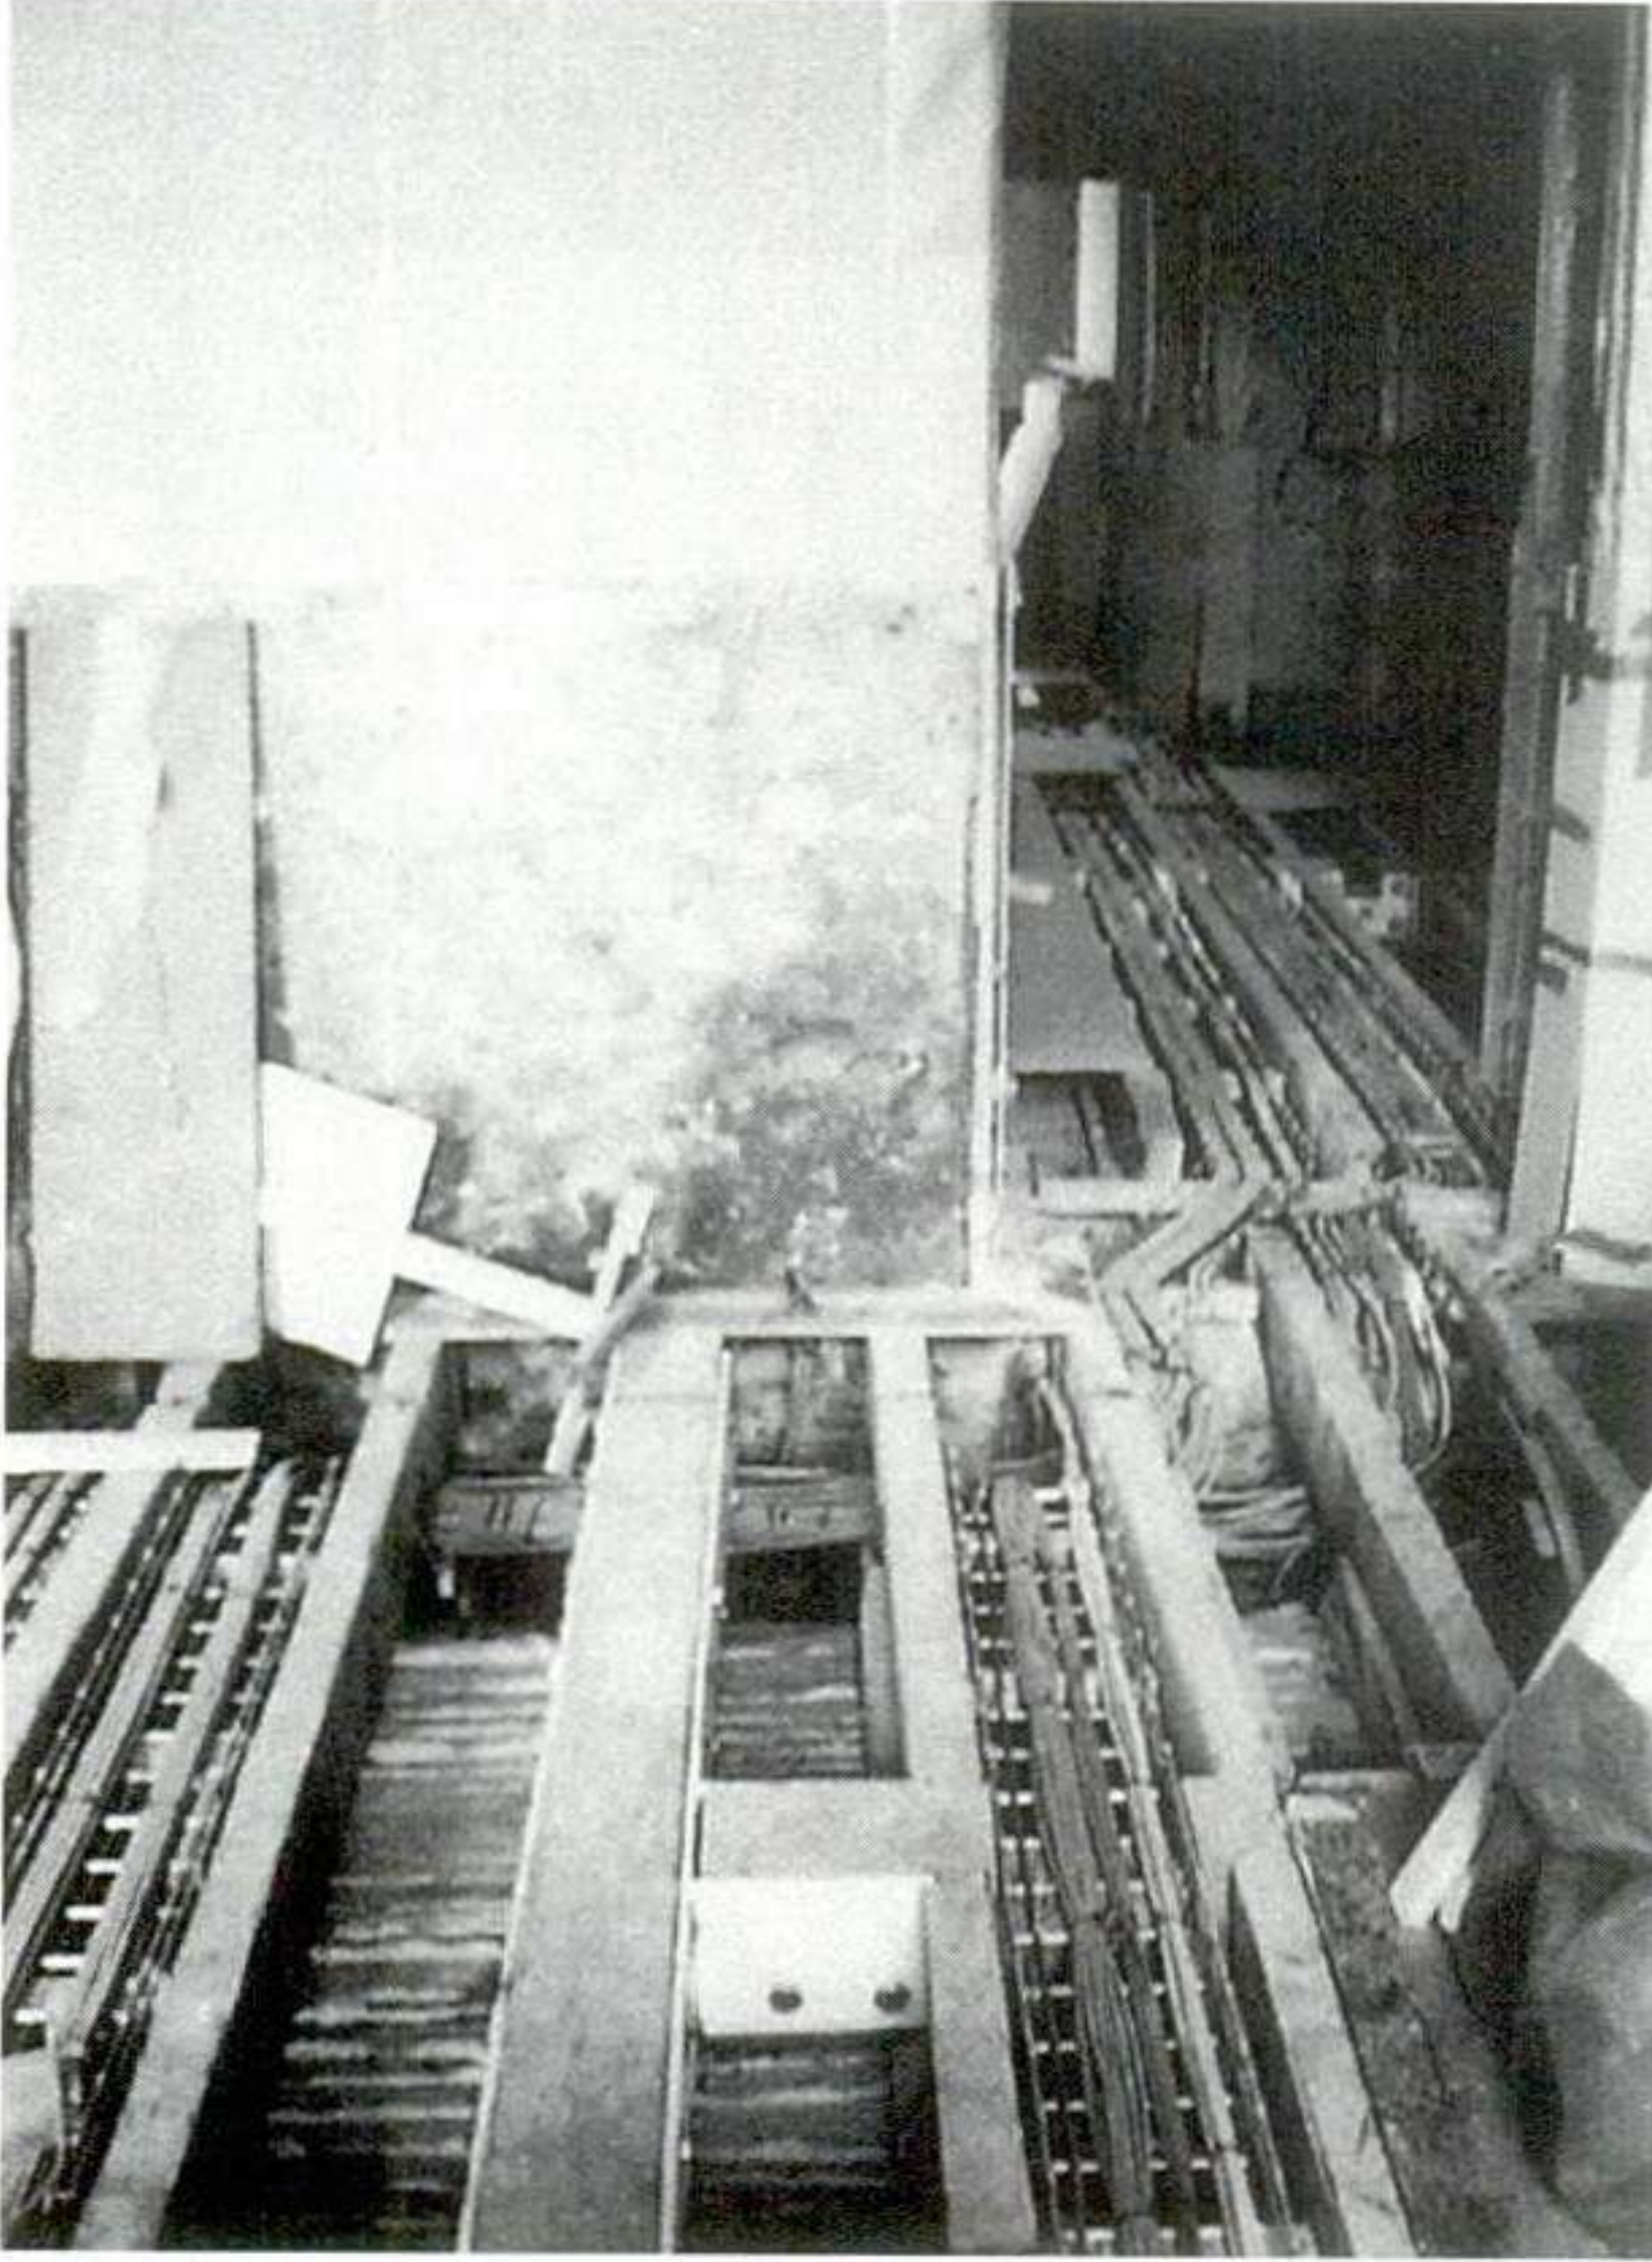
The timber floor at Duff House was lifted to allow access to the underfloor area for laying pipework.
